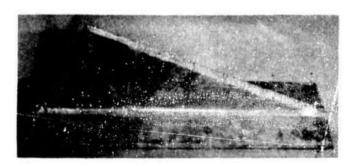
TENSION-COMPRESSION UNIT (PRIMARY UNIT)
